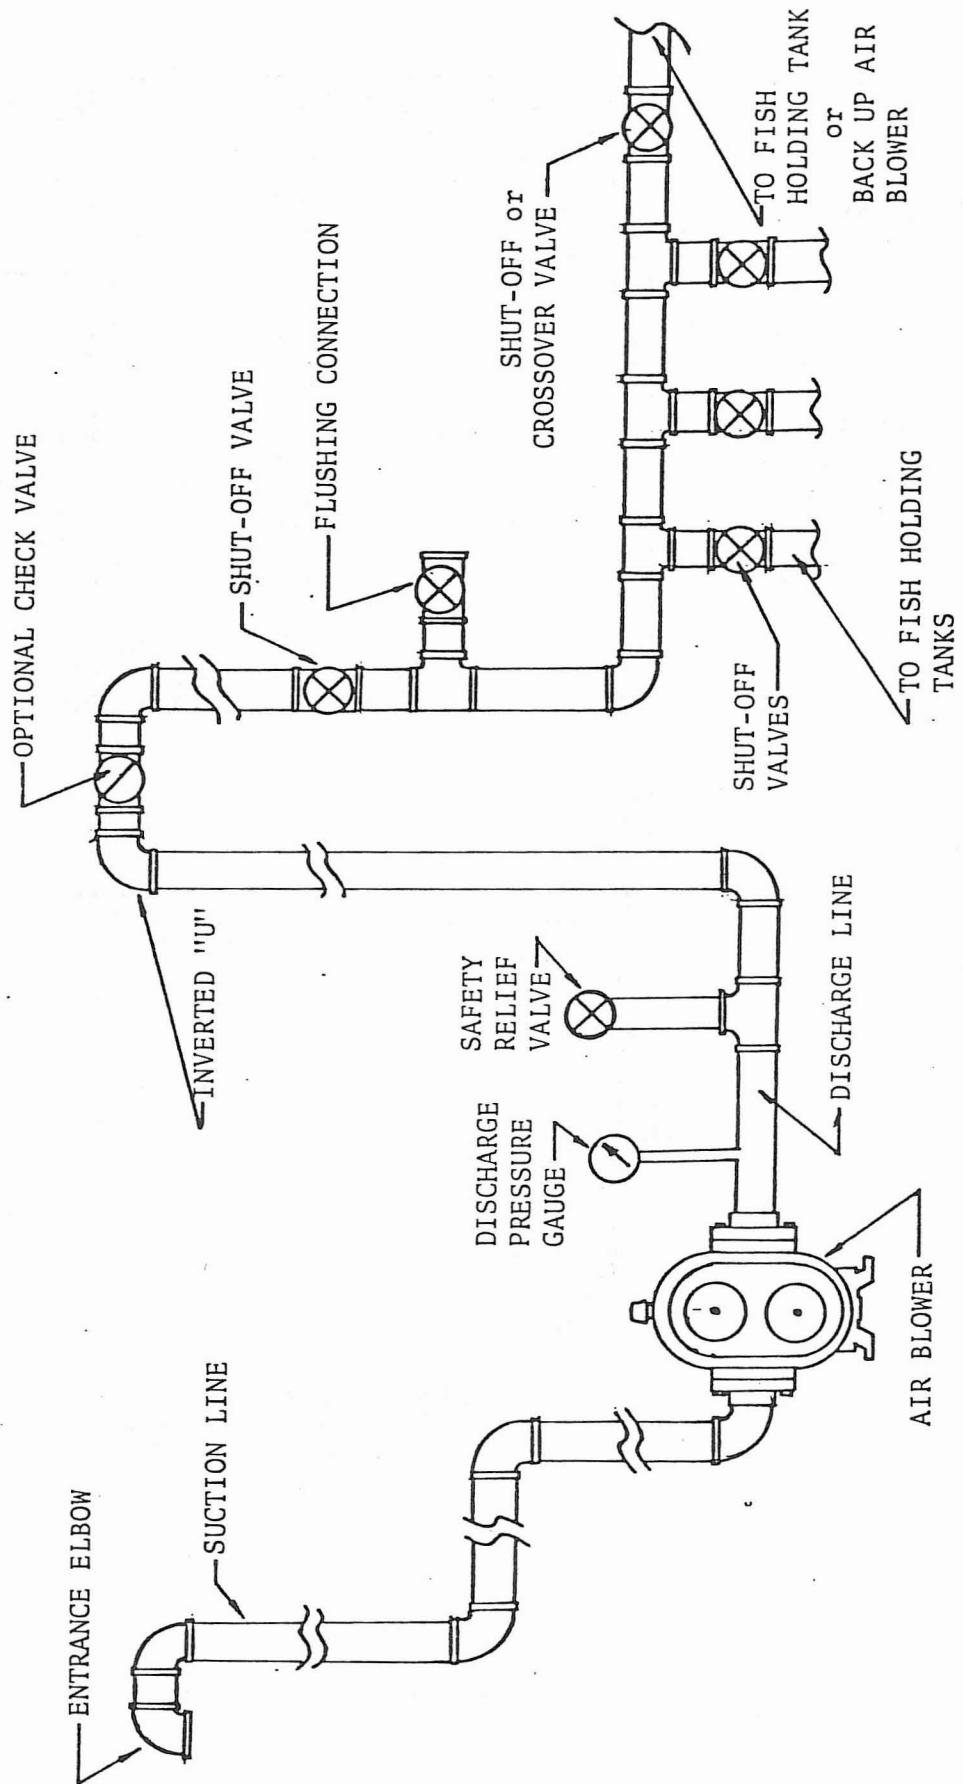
CSW piping arrangement outside of fish holding tank.
